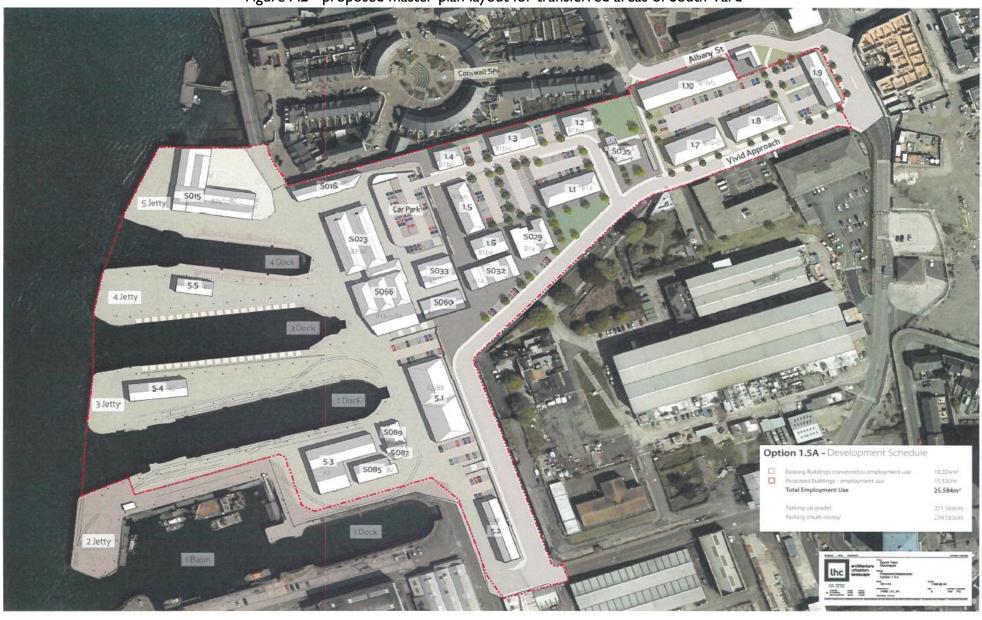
proposed master-plan layout for transferred areas of South Yard
